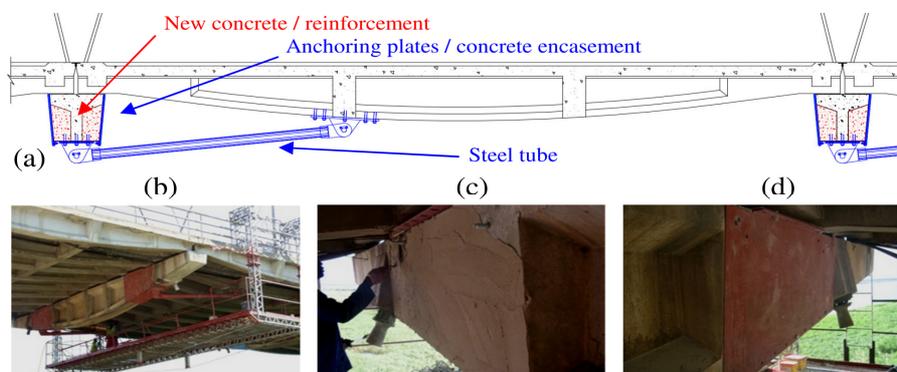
Stabilization of the transverse beams: (a) longitudinal section, (b) overall view, (c) placement of new concrete, (d) anchoring plates and concrete encasement.
